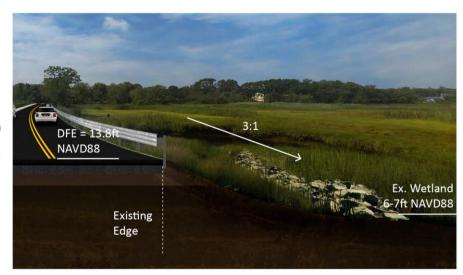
Conceptual Cross-Section of Raised Access Road with Berm
